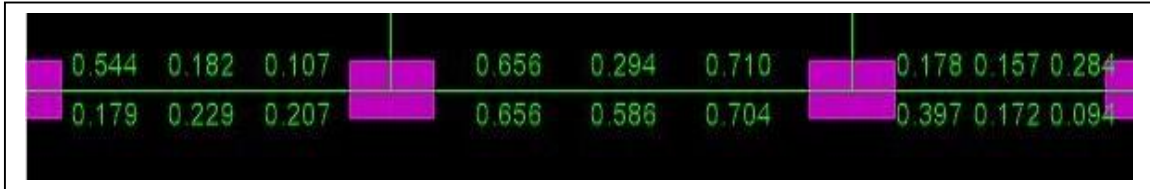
Steel Area of Roof Floor Beam Y-axis
